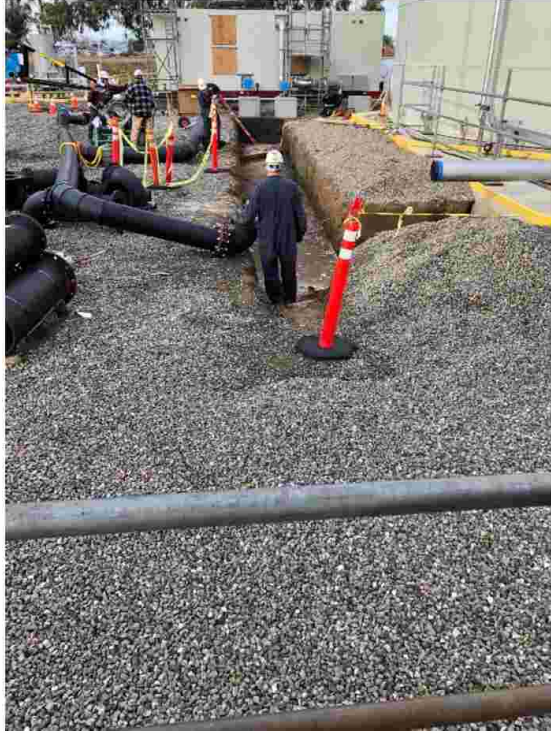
More assembly of pipe near the fire pump on November 30, 2018.
